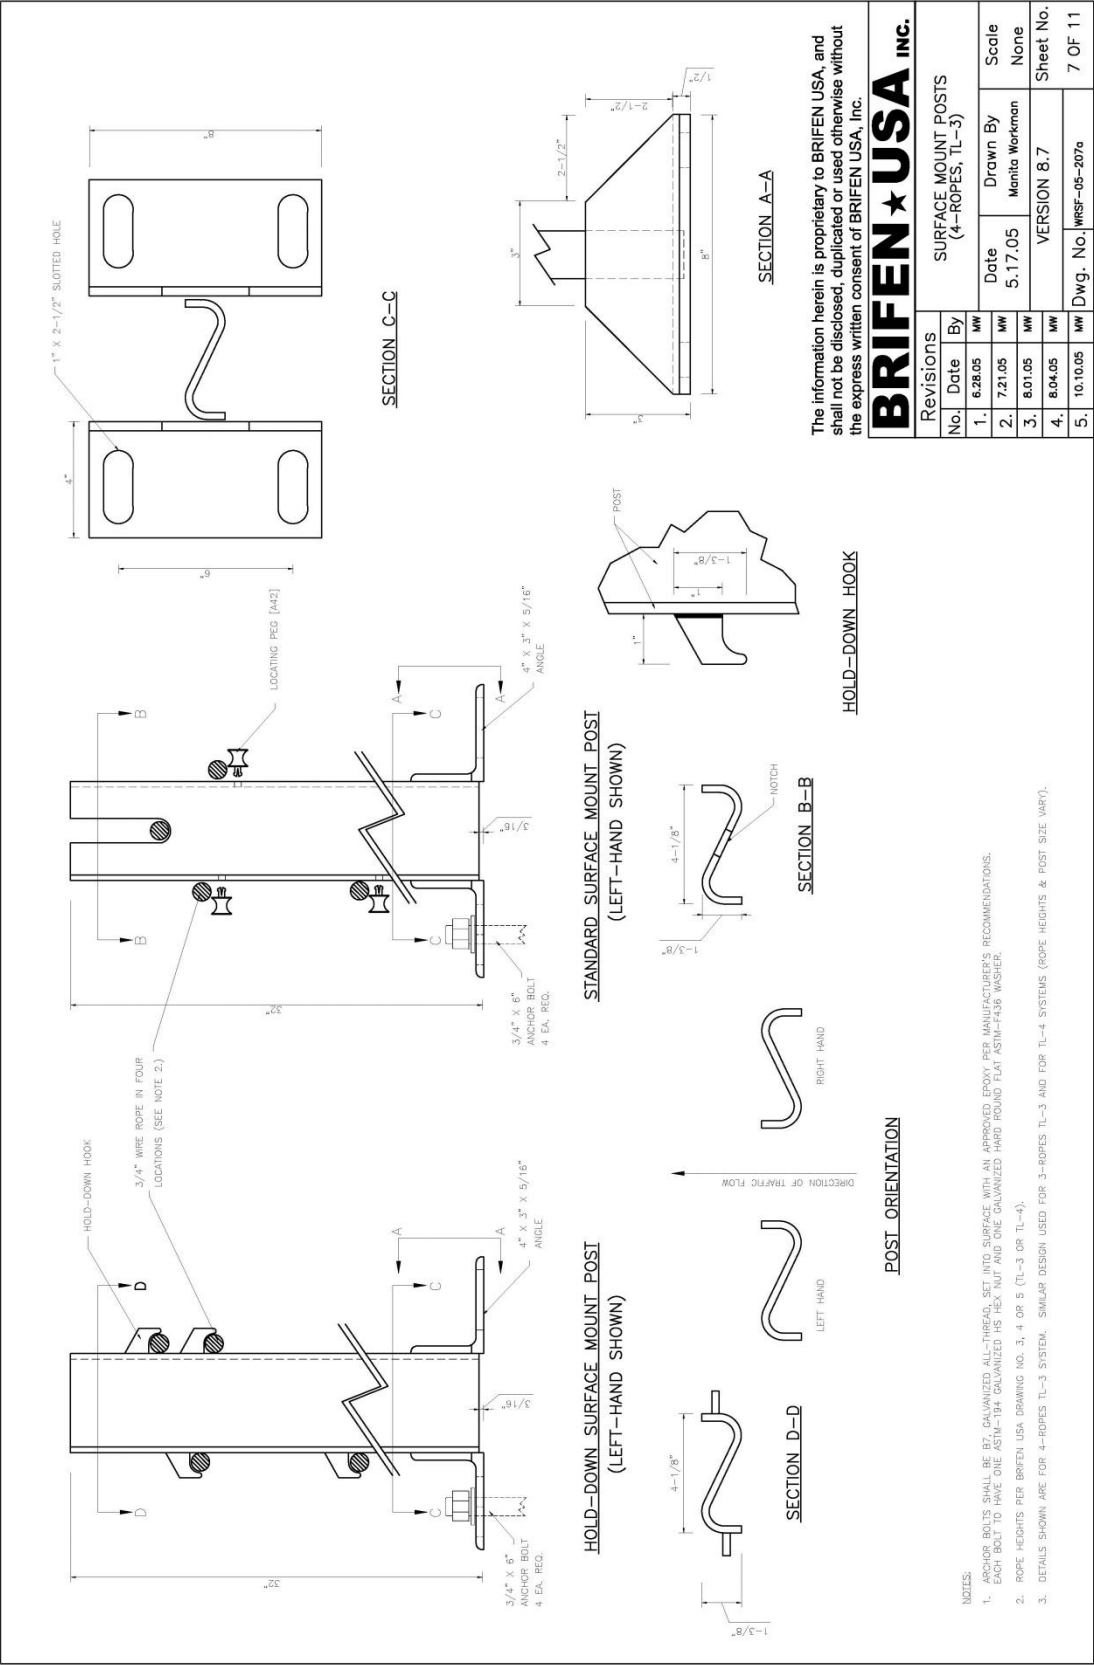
Typical TL-3 Brifen WRSF Surface-Mounted Post Design Details [34]
